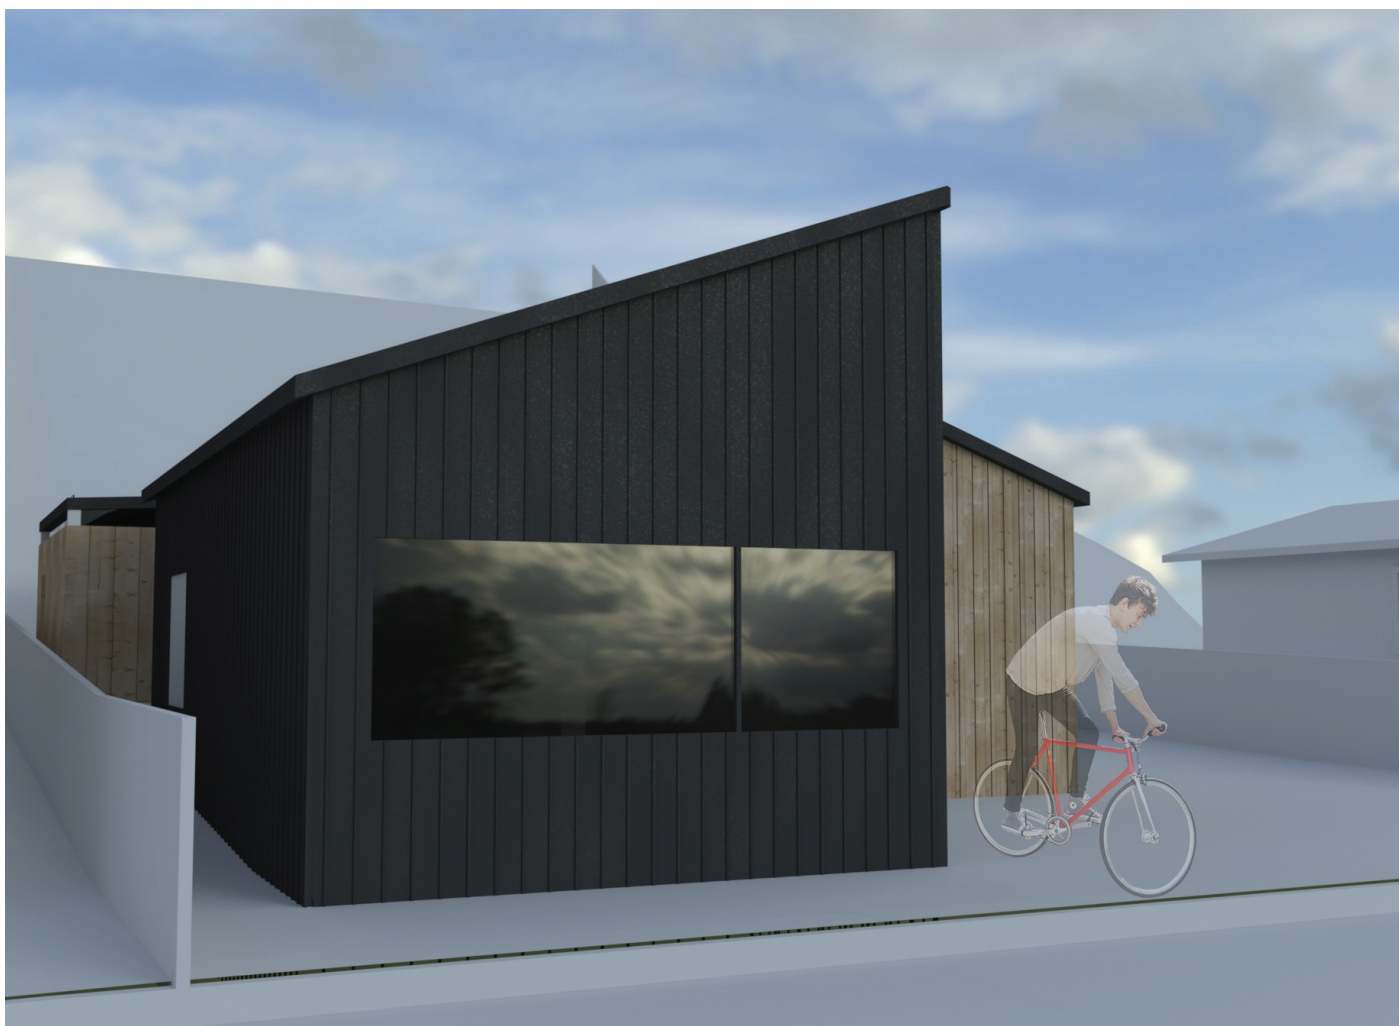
12 months post-disaster. The damaged house has been demolished. The initial shelters are still in place, but with a new roof and new cladding panels. New modules extend towards the front of the site. These have been designed with a new aesthetic, referencing the gable roofs which are common down Awarua Street.
